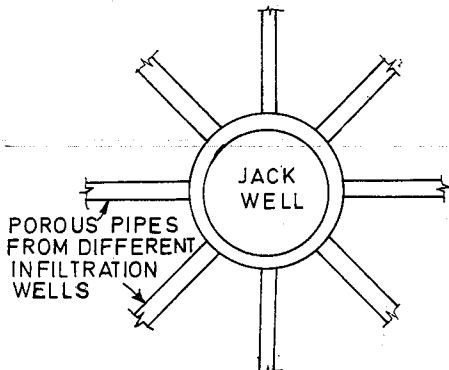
Plan of a jack well drawing water from several infiltration wells.
